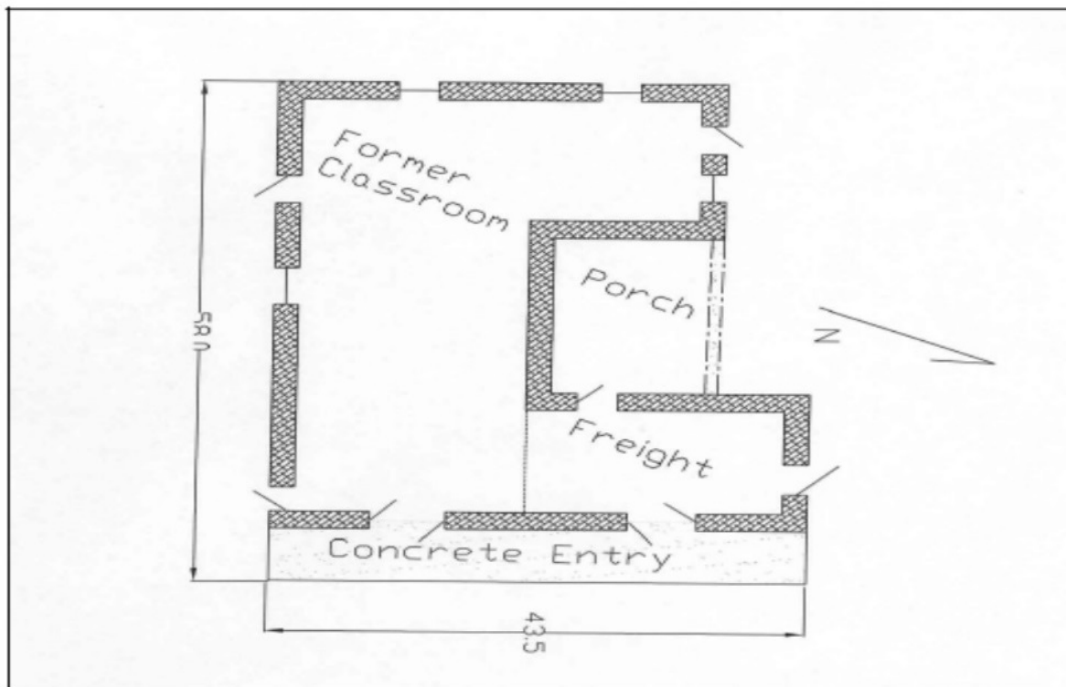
Interior Floor Plan of 1893 Schoolhouse (Ackerly 2004:6-8)
